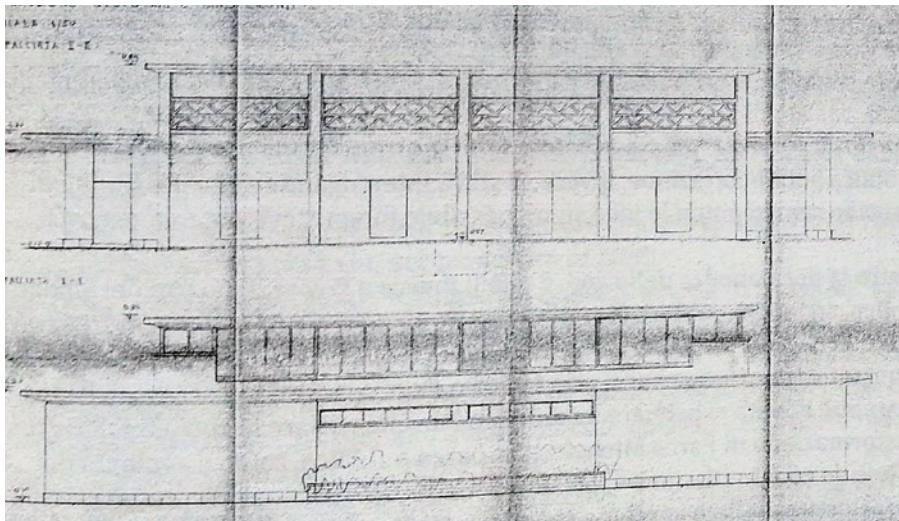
North-south elevations (Source: De Lucchi & Gaido).
